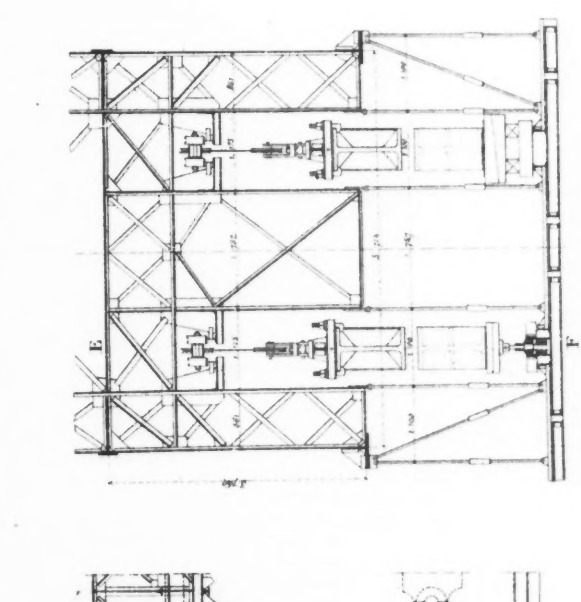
LONGITUDINAL SECTION OF SUSPENDED CENTERING.
